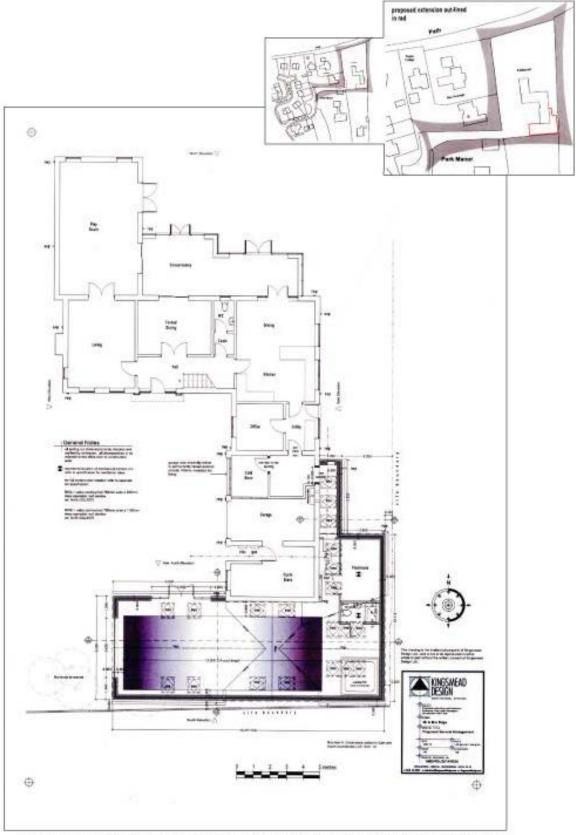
Plan of development footings for new single storey swimming pool extension to Parkwood, Donington. Plan supplied by client. 1:200@A4. Inset: Site location map, not to scale.
